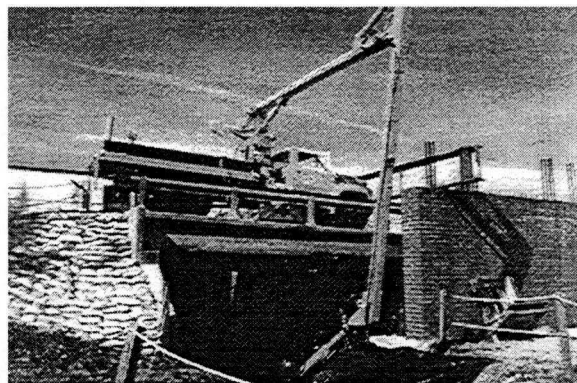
Peeper Crane with Robot Deployed under Bridge Test Facility
